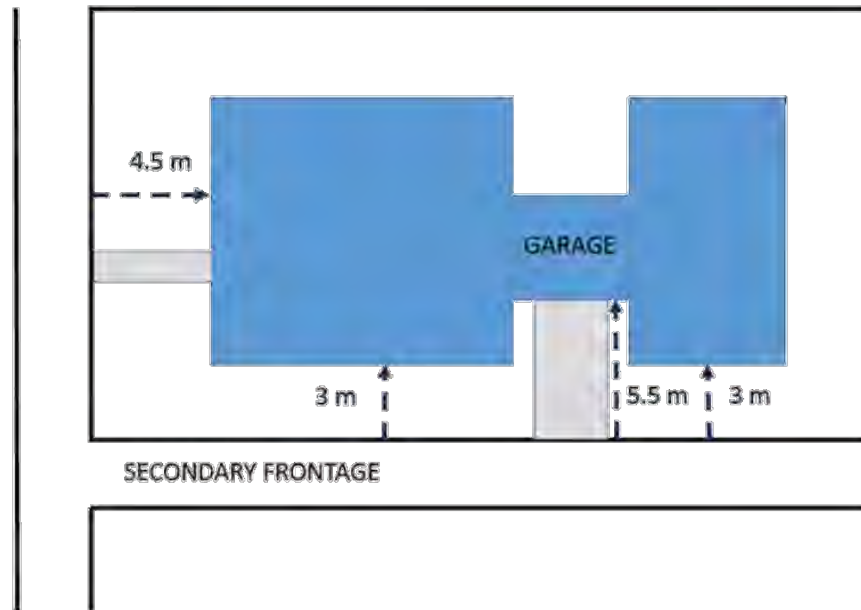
Corner allotment with the main entry to the primary road and the garage to the secondary road, with a setback minimum of 5.5 metres
